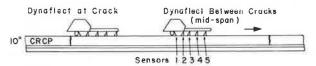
Layout plan of selected test locations, sections 1, 2, and 3.
